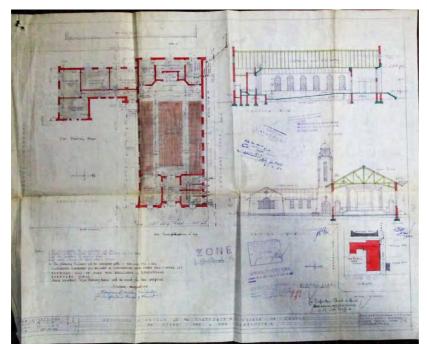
Ground floor plans and sections (Source: City Council of Johannesburg, Plans Archive)
